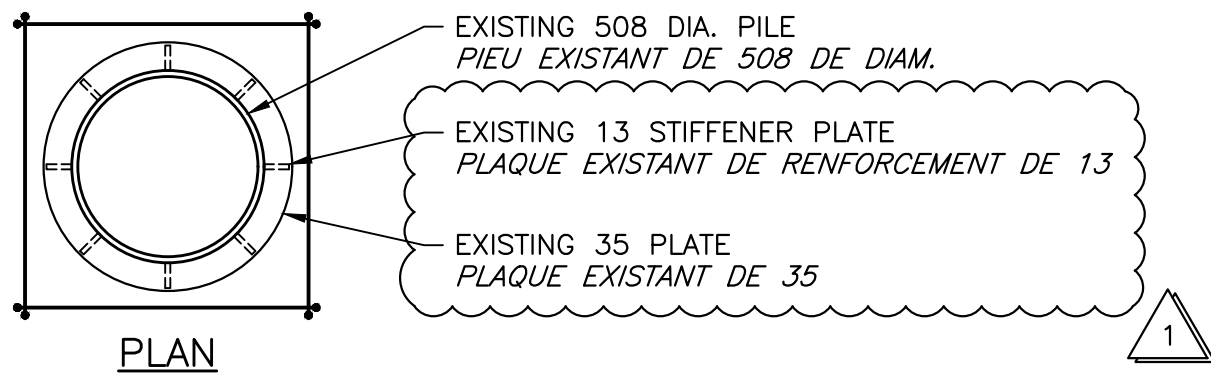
DETAIL – FLUSH MOUNTED PIPE PILE DRIVING SHOE
